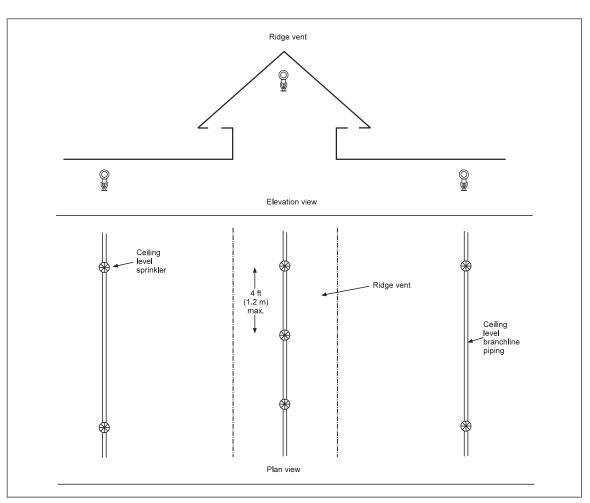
Quick-Response sprinklers installed under ceiling-level exhaust devices.
